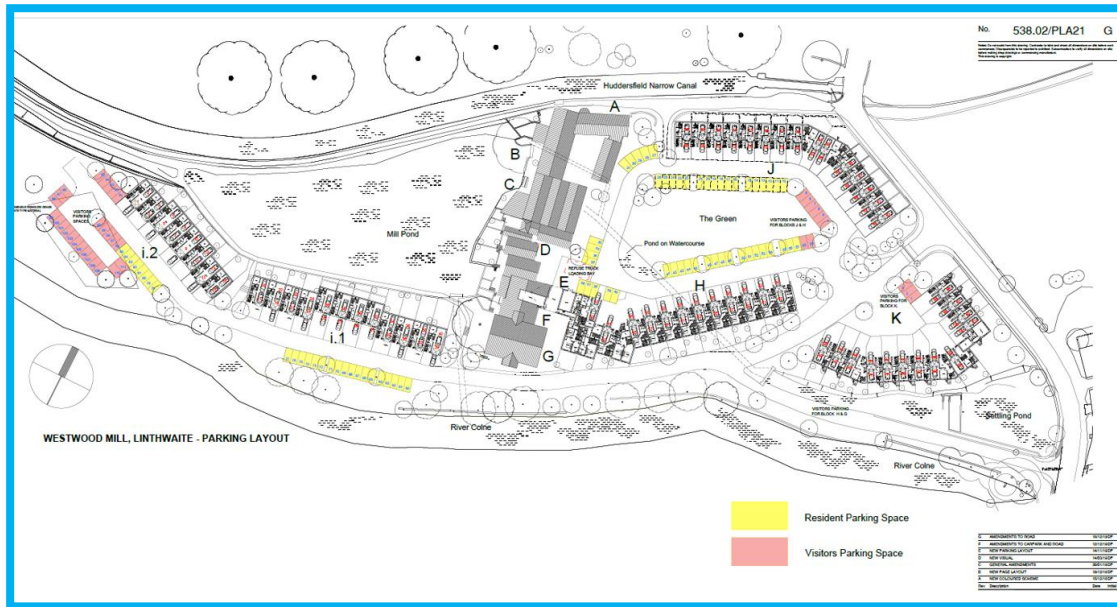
Proposed layout showing reuse of mill building, with terraces of new houses to the east and west. Note that most buildings tend to have car garaging at ground level, although some buildings in the east (which are safely above predicted flood levels), include habitable space at ground level.
